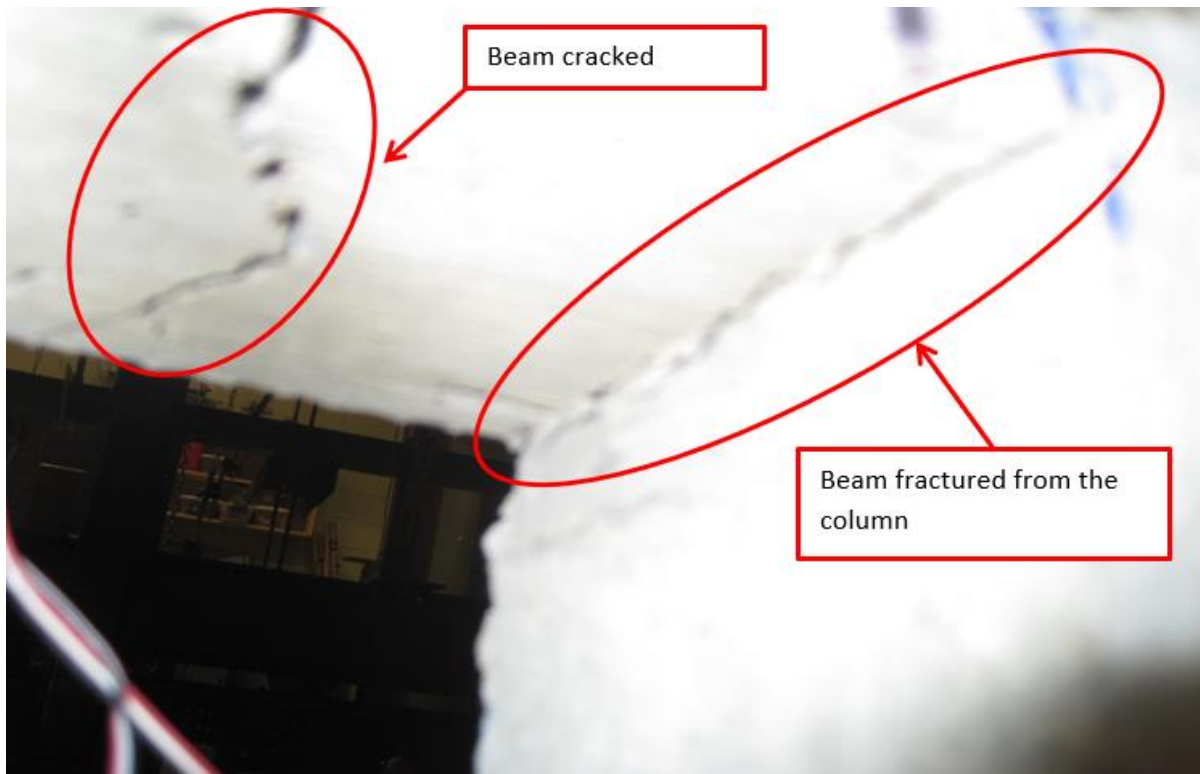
Underneath Crack Pattern in the Missing Column for Specimen B2-2
